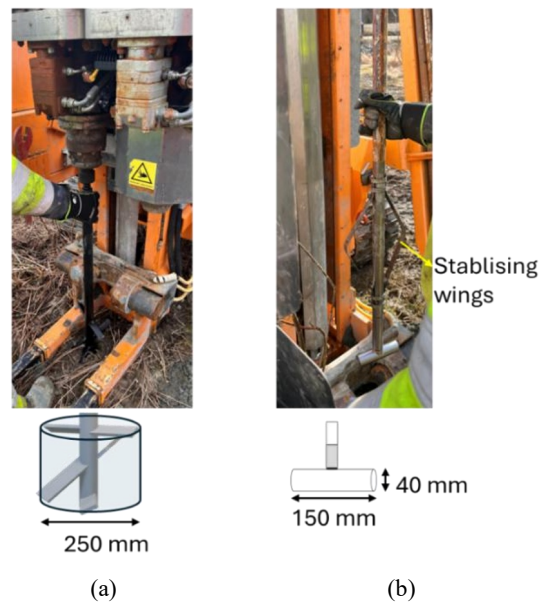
Equipment for field detection of quick clay, (a) mixing module; (b) modified T-bar.
